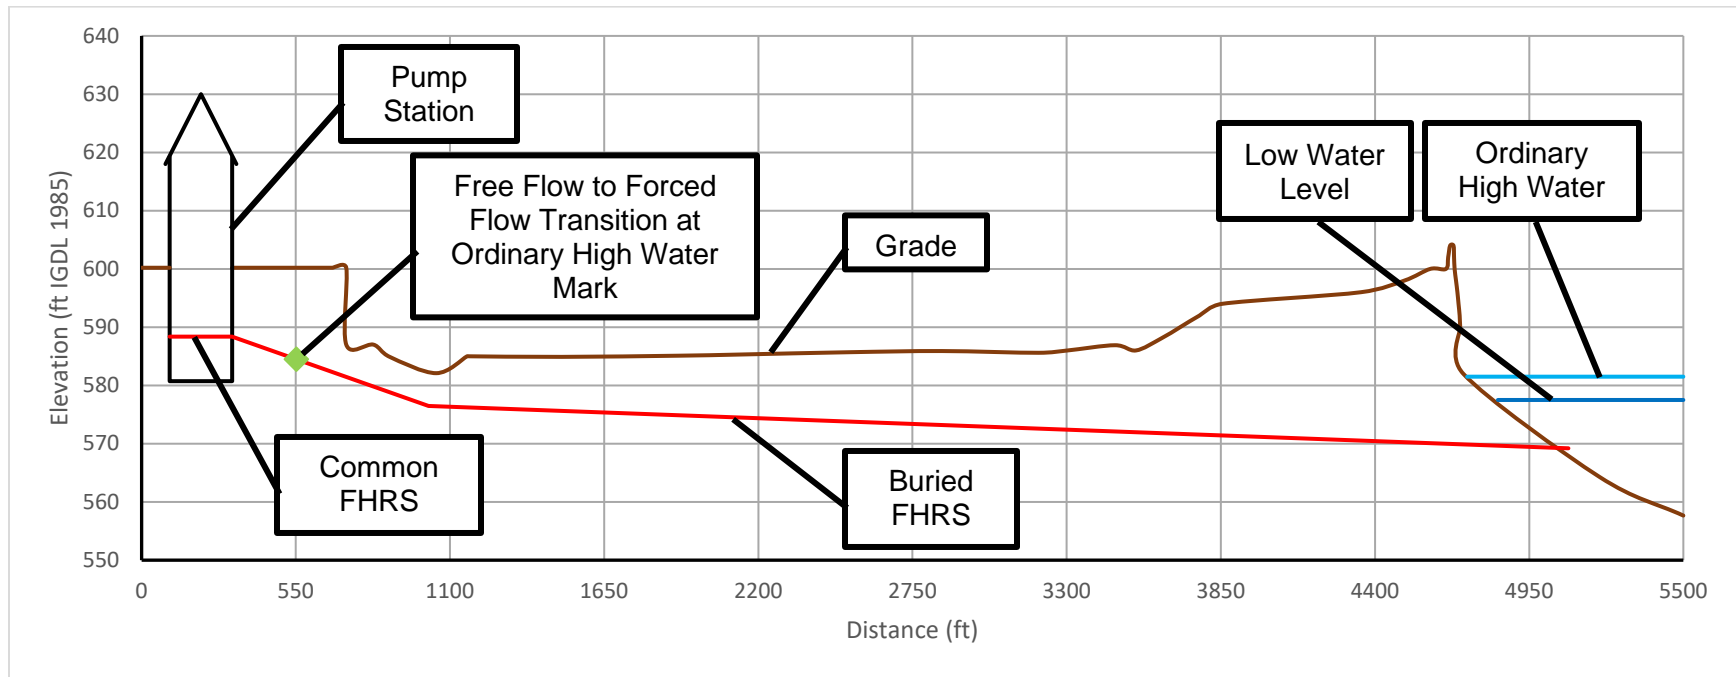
Pump Station #1 Fish Handling and Return System Cross Elevation
